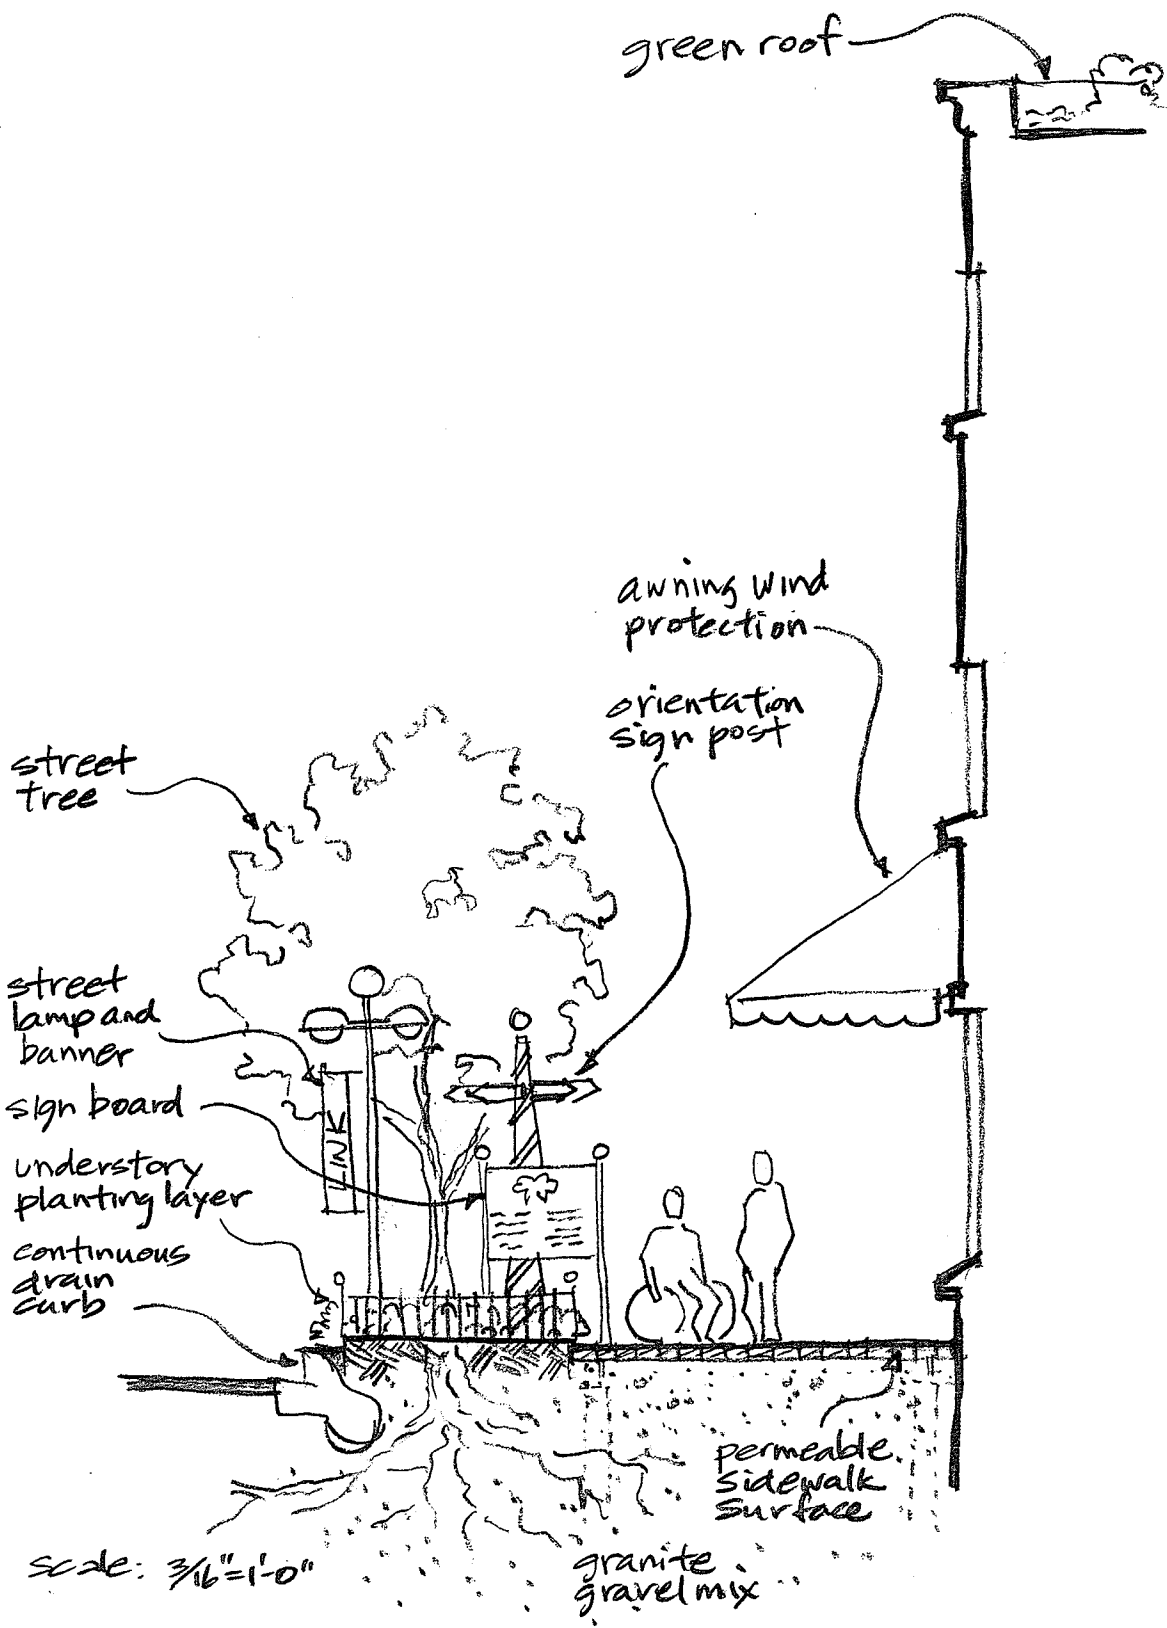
Cross-sectional collage of proposed 'Link' sidewalk design (author).
